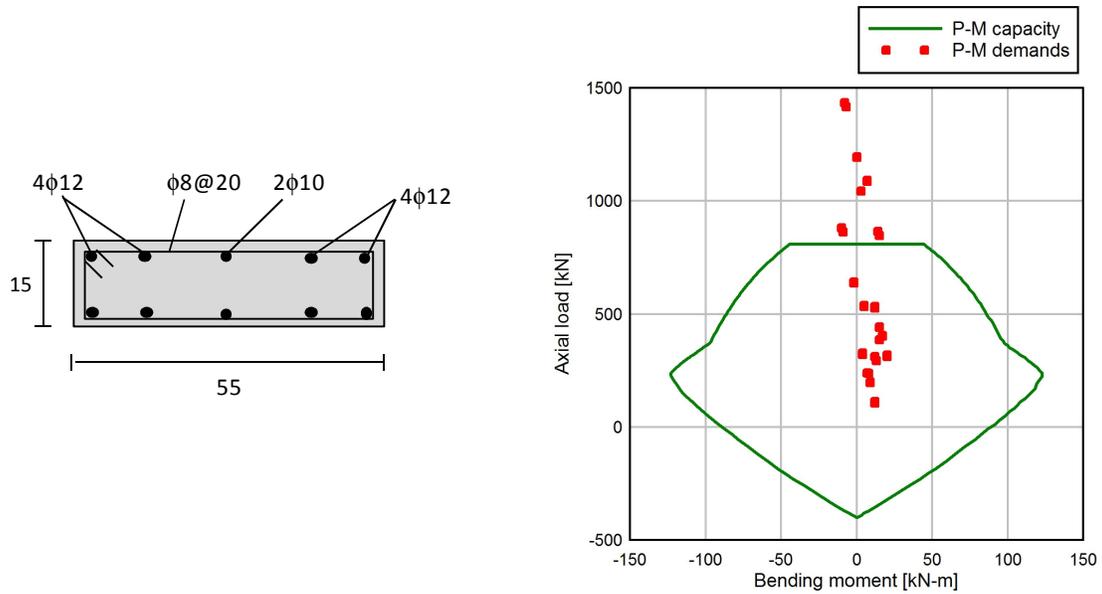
Typical detailing of 55 x 15 cm walls and confined concrete at the stirrups level (left) and interaction diagram of 55x15 cm wall in the basement of axis 9 (right)
